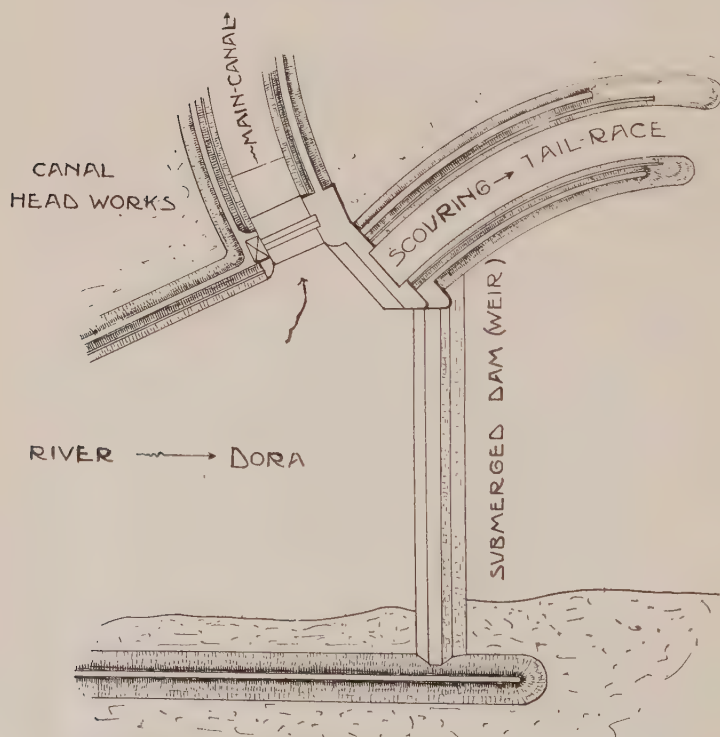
Headworks of the Cavour Canal (Farini Branch).
